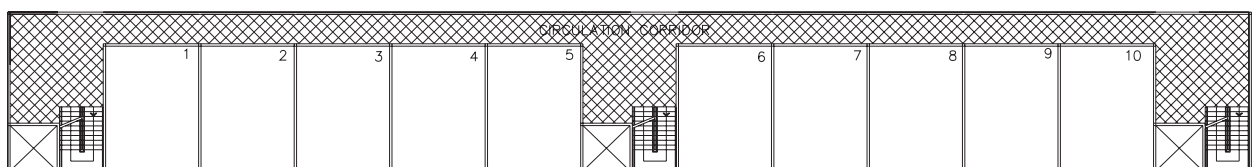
Typical floor plan of test buildings, TB1 and TB2
